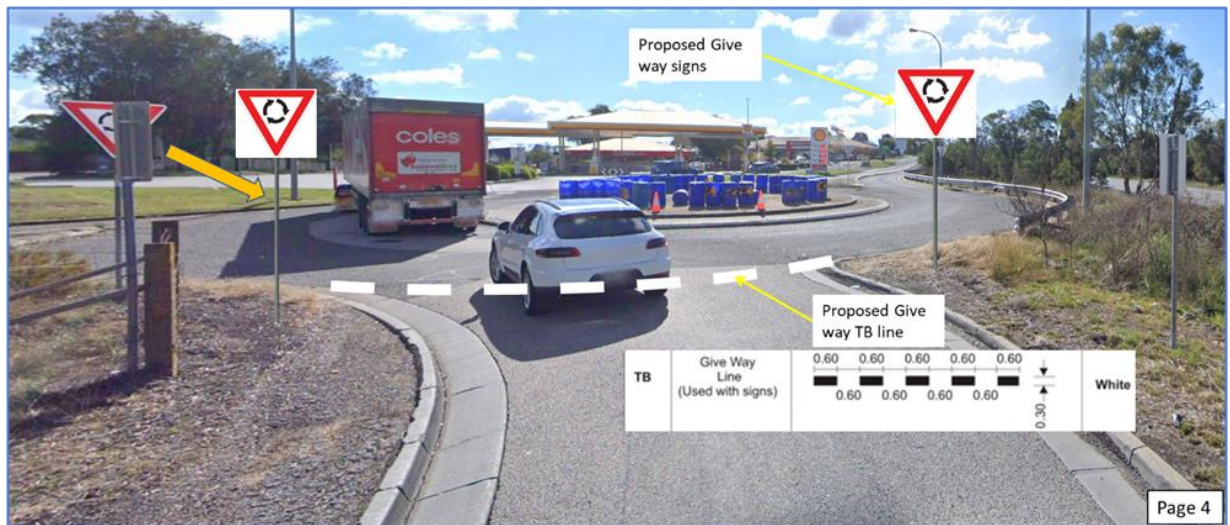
Showing proposed TB line and replacement of roundabout Give way sign.
